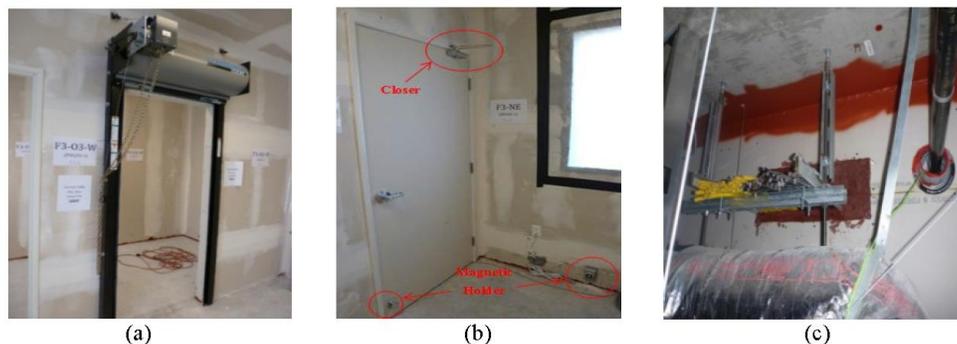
Fire protection systems on Floor 3 (a) fire door; (b) door closer and holder (c) fire stop systems.
